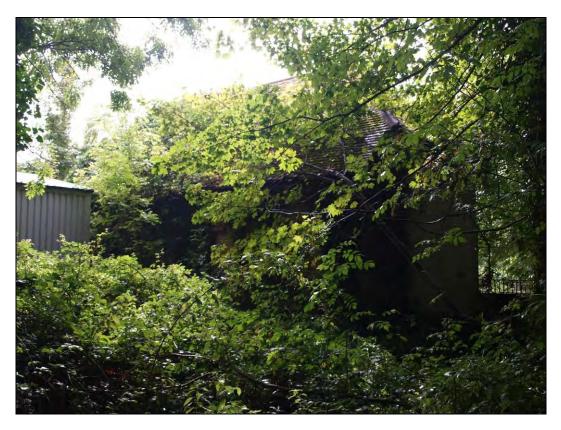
Stable, northern and western elevations, facing southeast (6959-0025)
